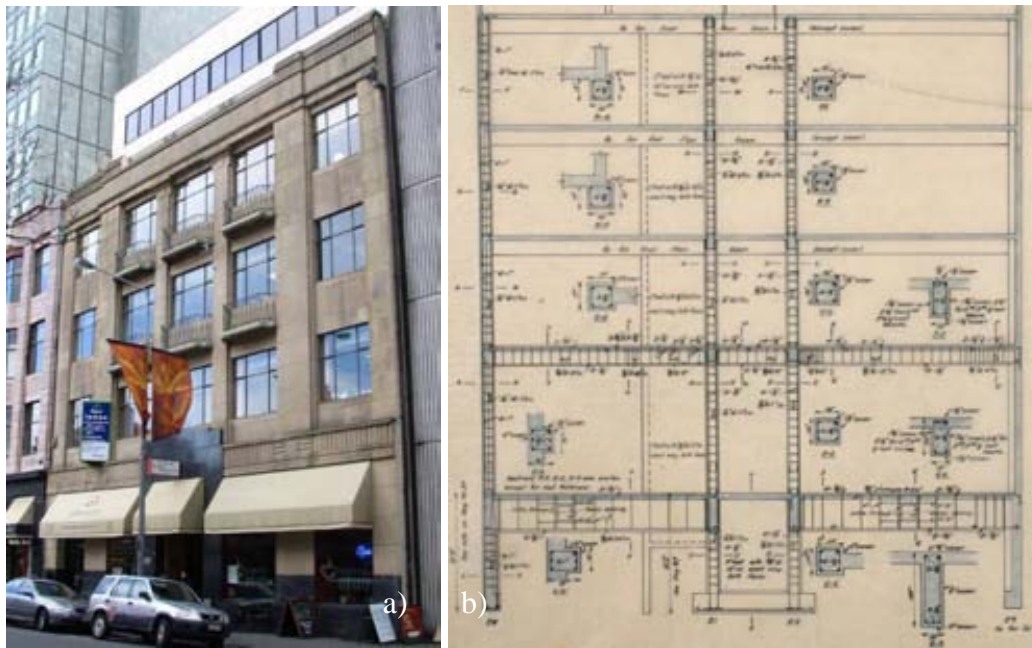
Case study building A: a) Front elevation wall with large openings; b) Structural detail of the RC frame in the transverse direction.
